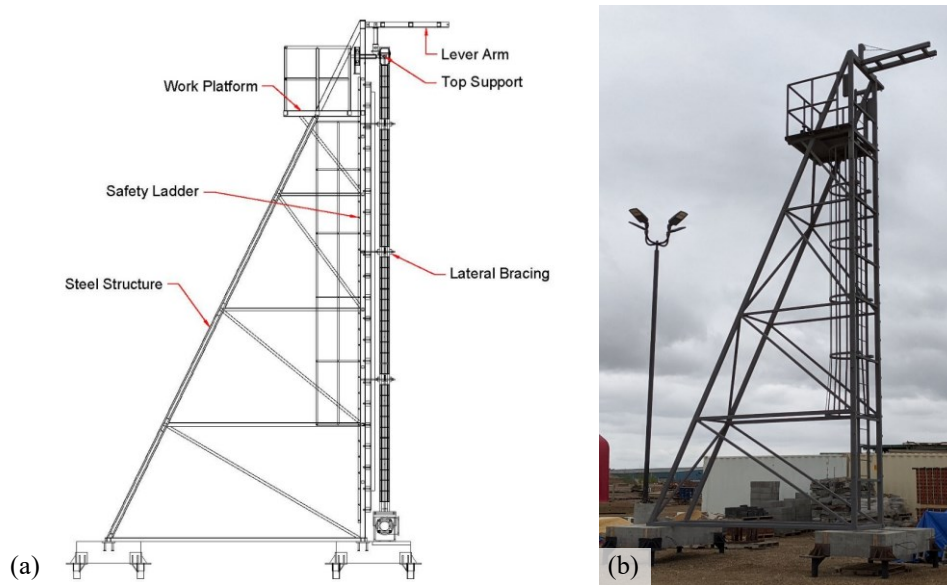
Steel structure to test tall masonry walls (a) CAD drawing (b) Photo
